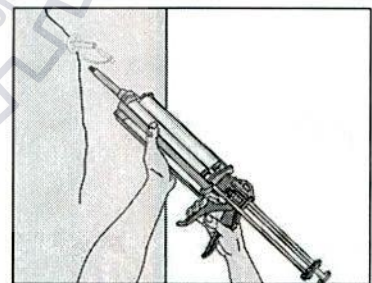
Grout injection in vertical crack of masonry wall
